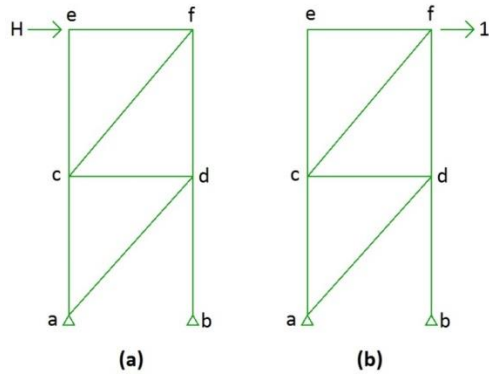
A truss-braced structure (a) “real” structure subjected to horizontal load H ; (b) “virtual” structure subjected to a unit load 1 at joint f where the lateral deflection is sought.
